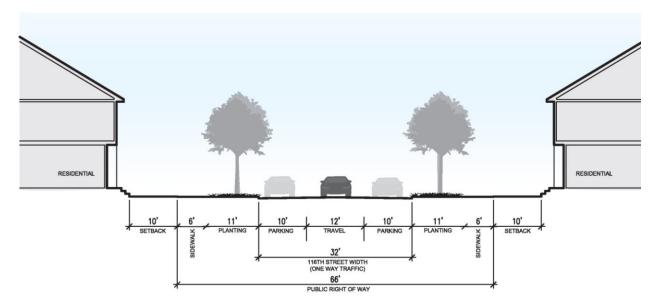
Typical residential street section in the Michigan Avenue station area on the 300 East block of 116th Street
